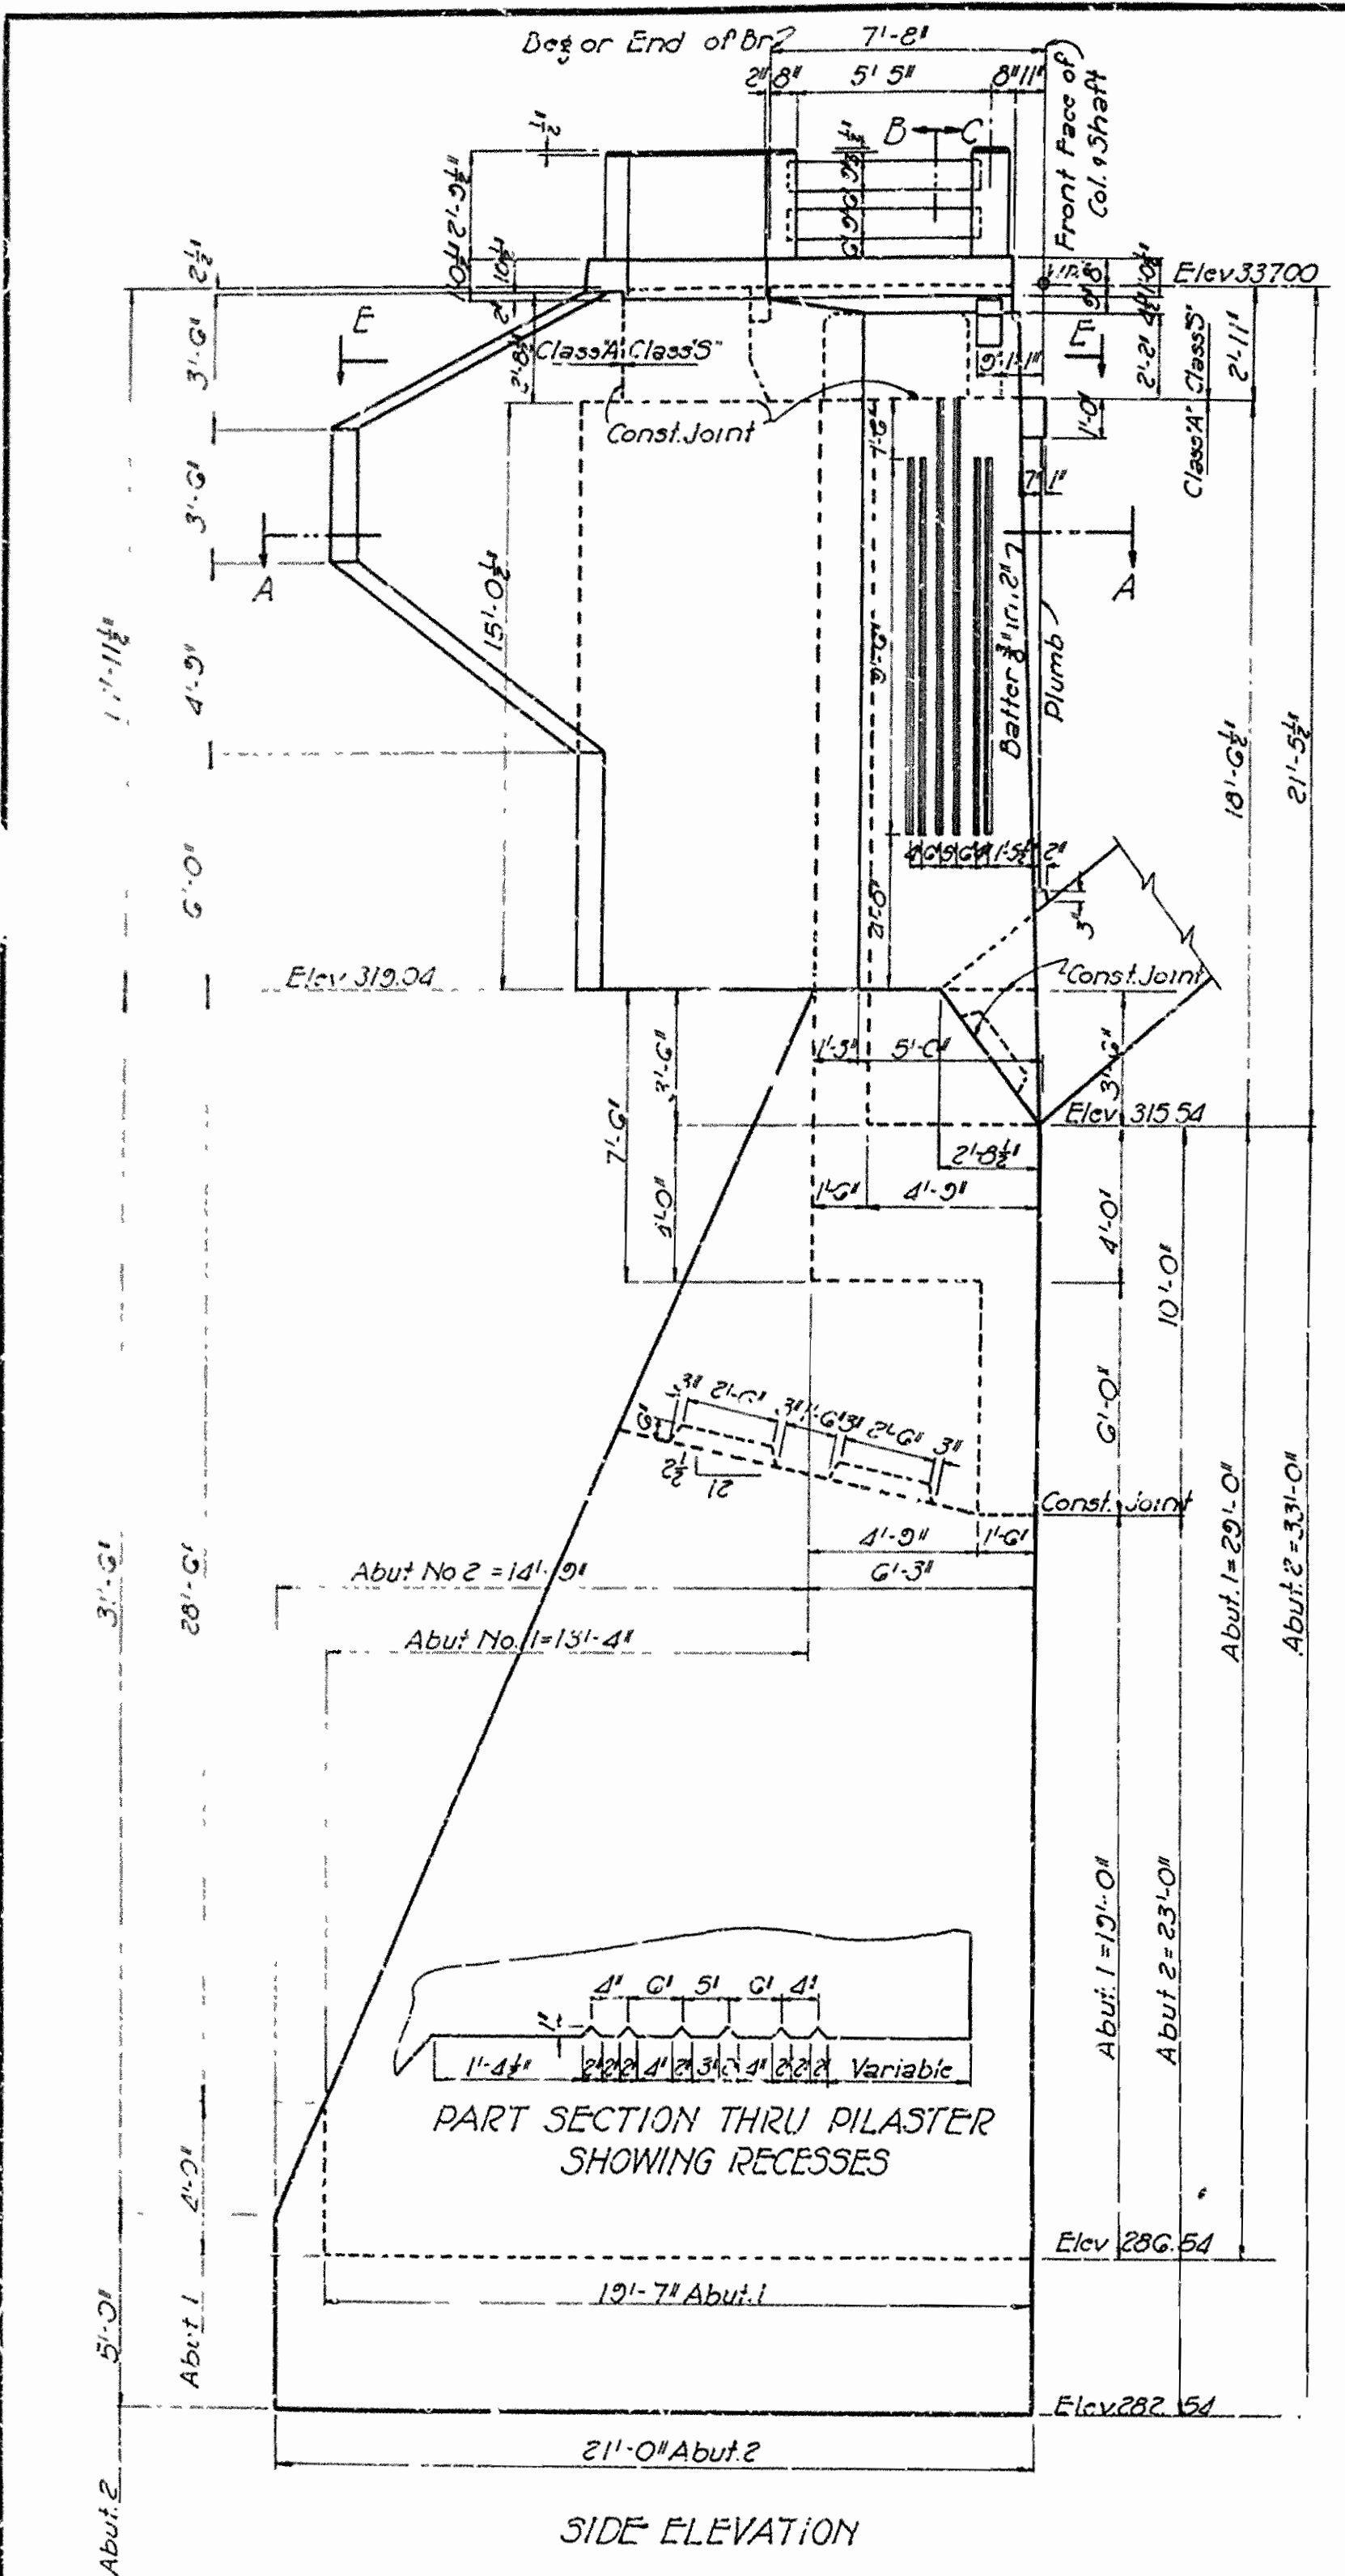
° ARCH SPAN BRIDGE OVER SYLAMORE CREEK MOUNTAIN VIEW-CALICO ROCK ROAD STONE COUNTY ARK. SEC.
